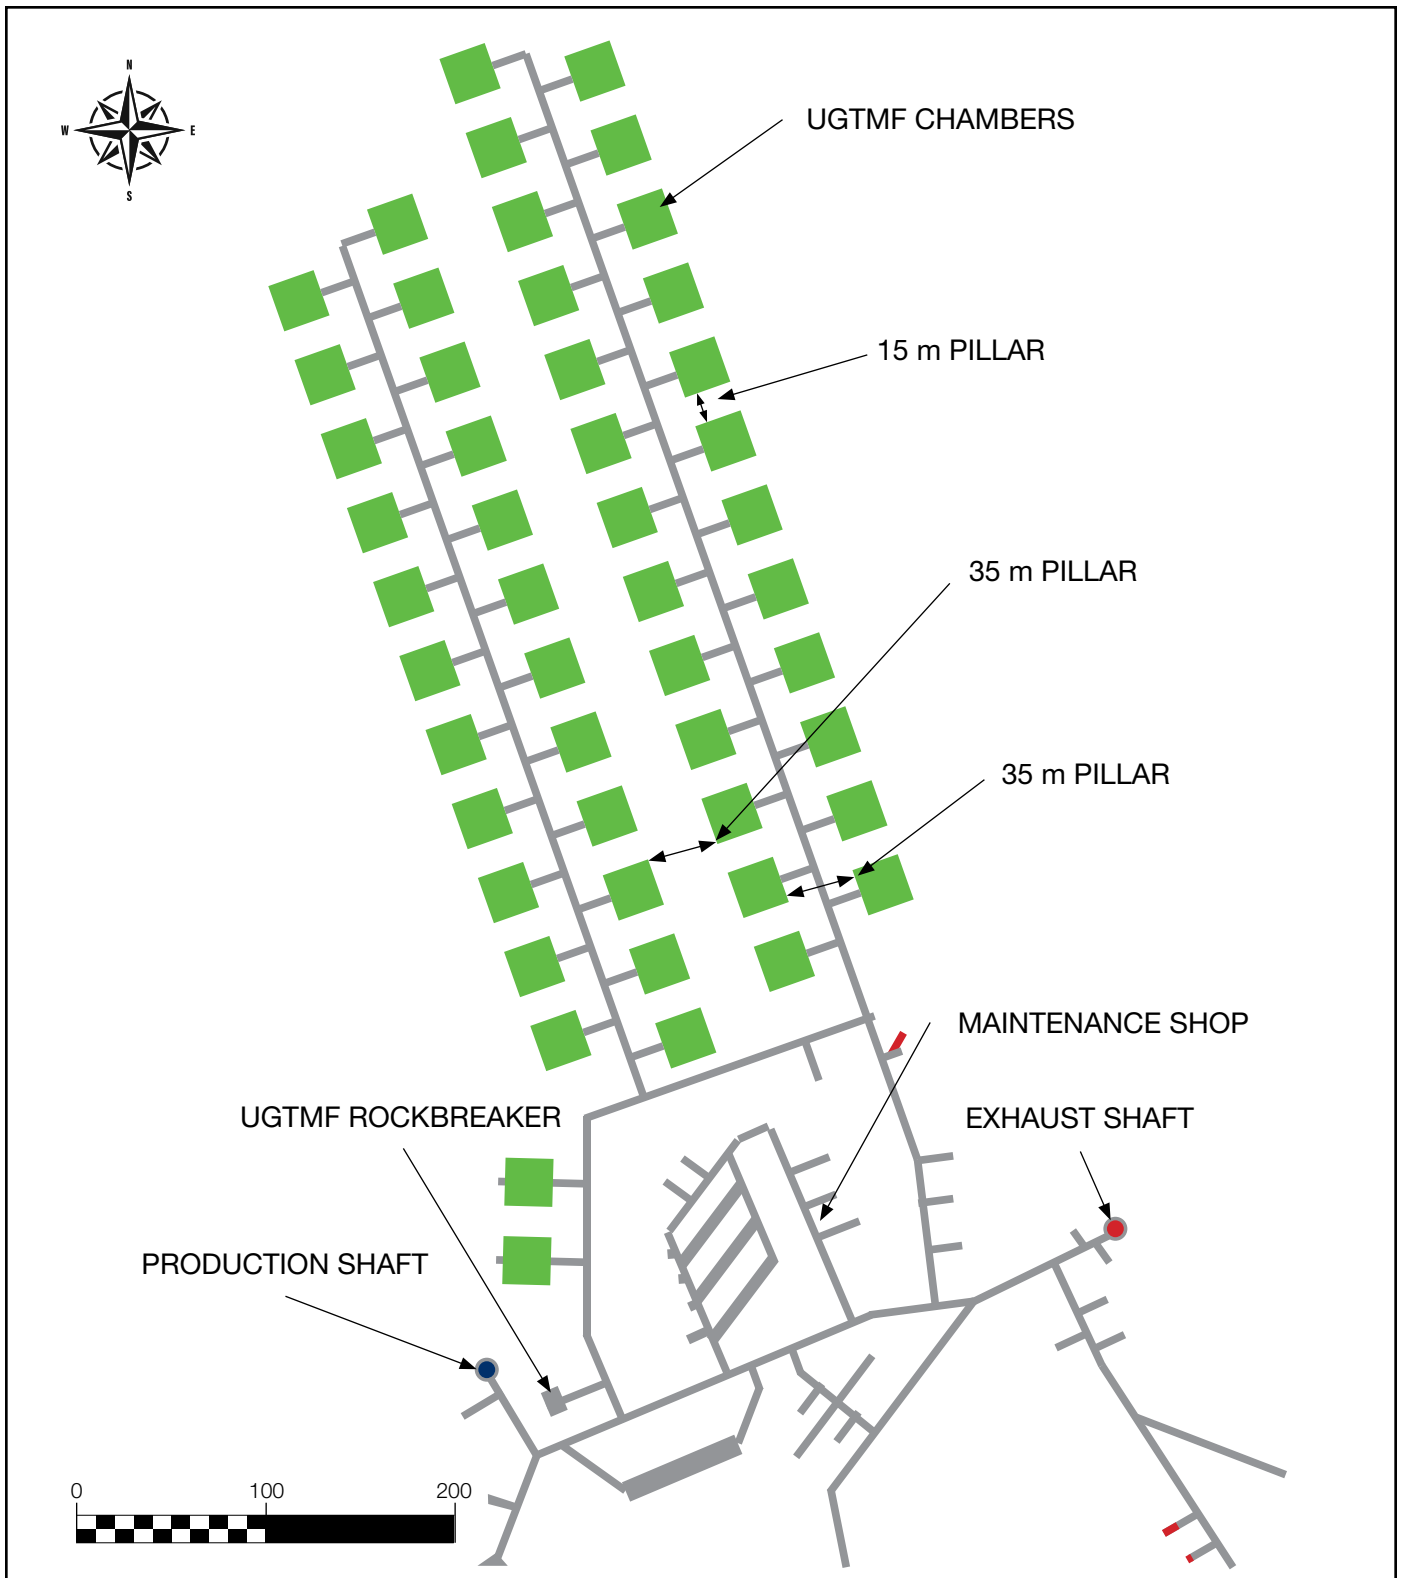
Rook I Project Underground Tailings Management Facility General Layout
